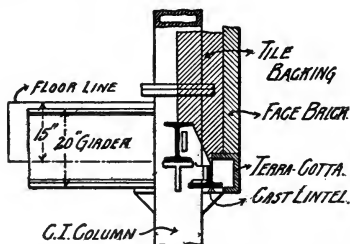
Spandrel Section, Tacoma Building, Chicago.
